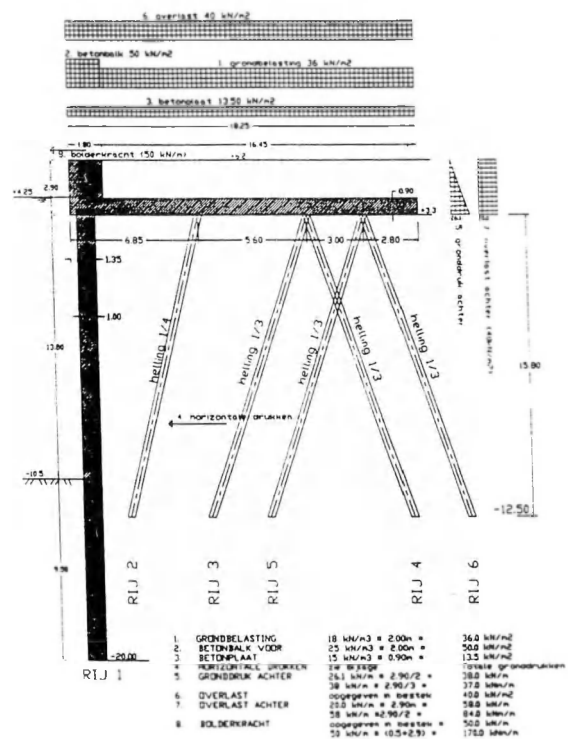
B — Quay wall on slurry wall — Loads on standard section (22.50 m).
